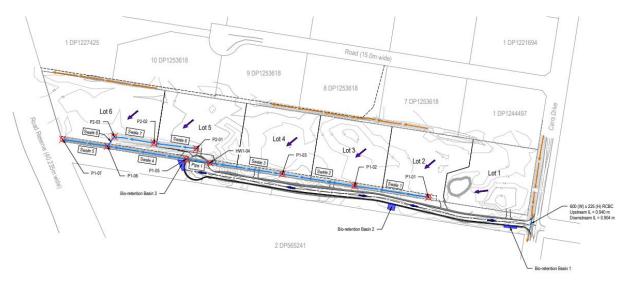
proposed lot layout and stormwater infrastructure including road to be constructed.
